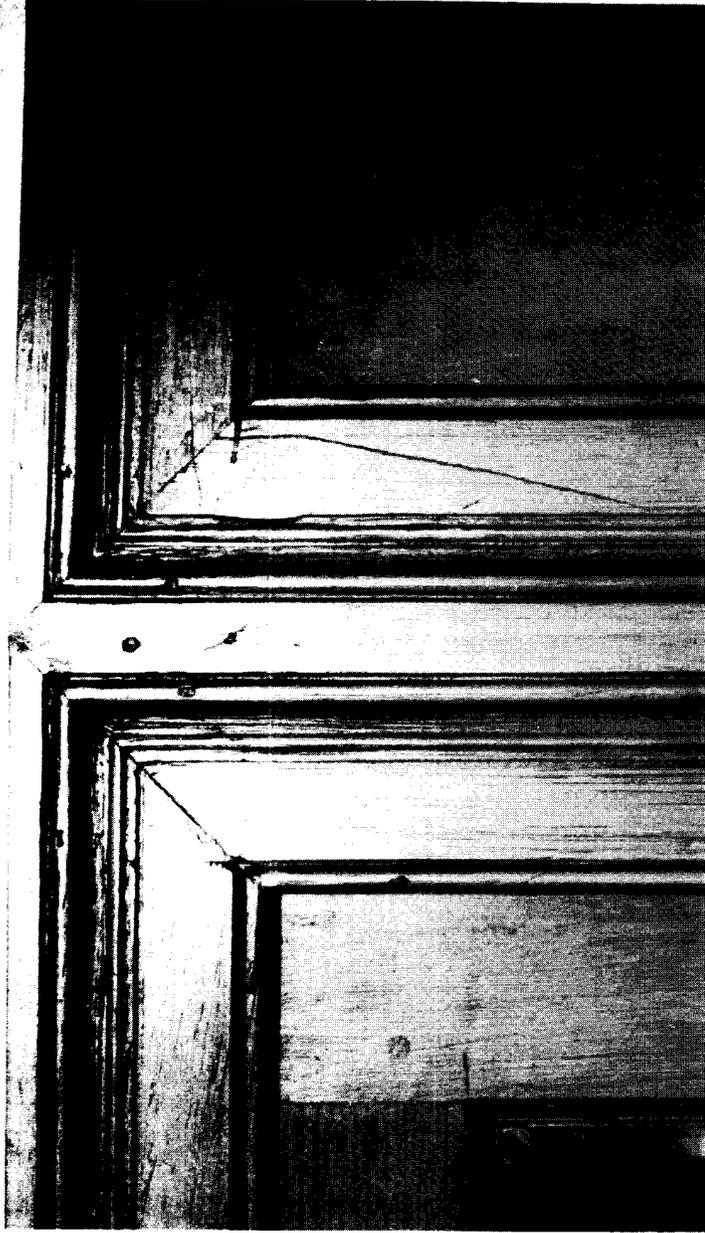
Atwood-Higgins House: East Front Room, Doorway Casings 101/102 and 101/104.
